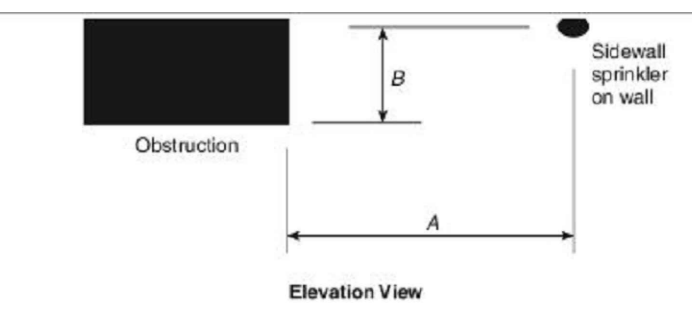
(b) Positioning of Sprinkler to Avoid Obstruction Along Wall (Residential Sidewall Sprinklers).
